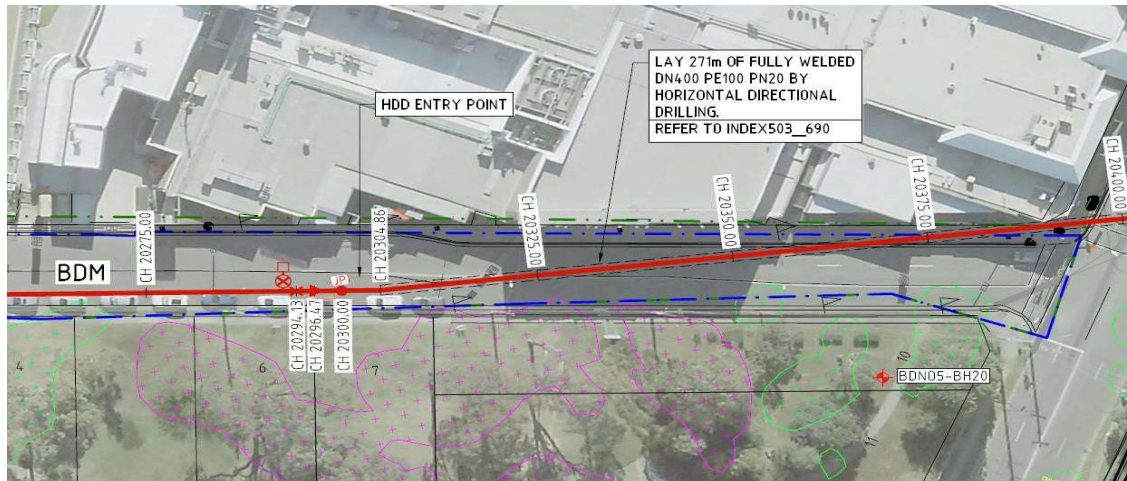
Cabramatta Railway Crossing (western side) parking space removal area
